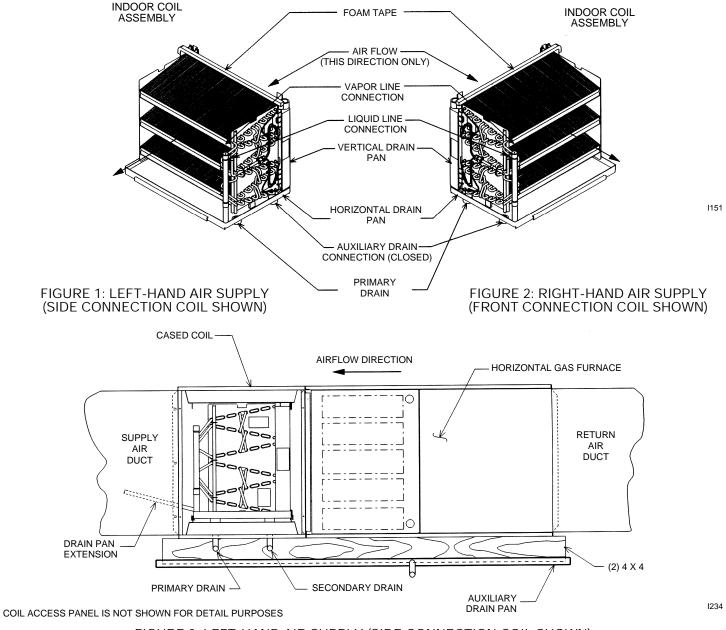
LEFT-HAND AIR SUPPLY (SIDE CONNECTION COIL SHOWN)
